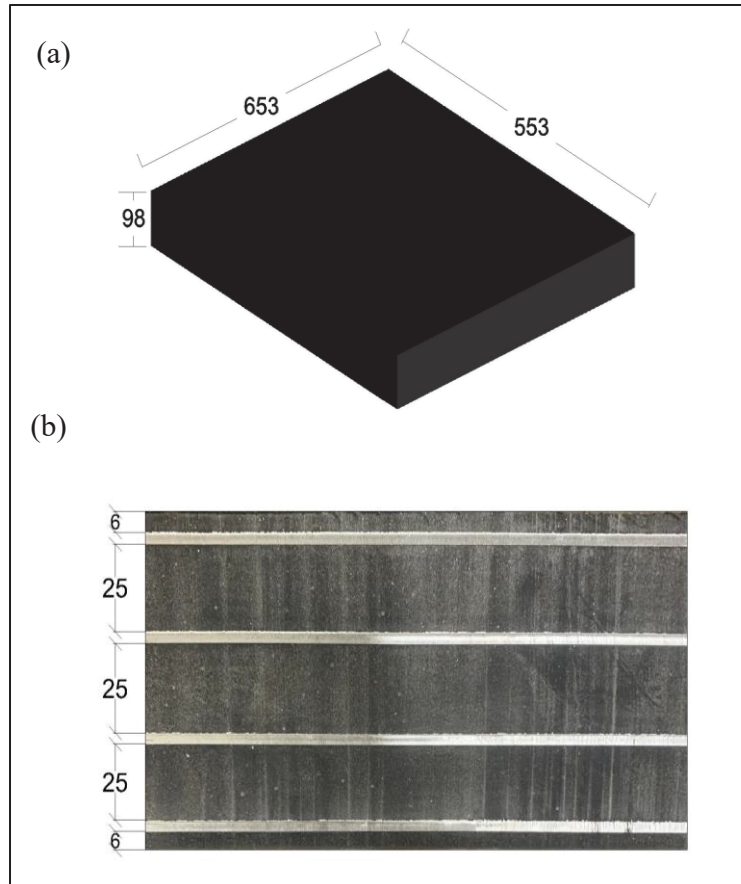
(a) Dimensions of original CHB bearing D4.27 (Series 2), (b) transverse section
